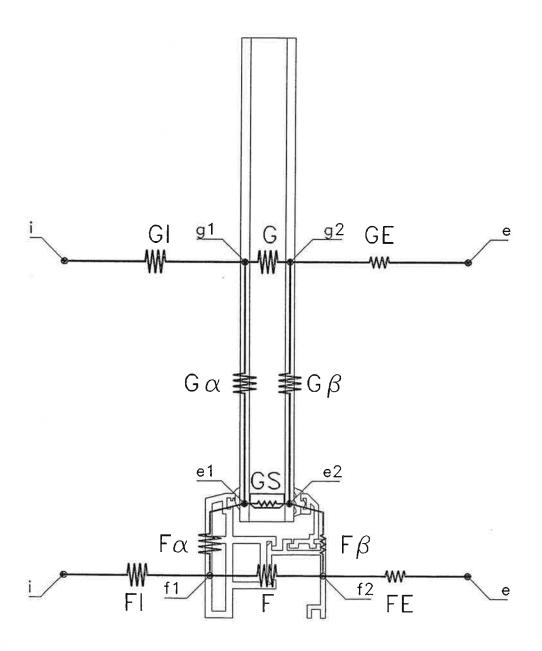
PVC-U or timber window frames with aluminium cladding on the warm-side
